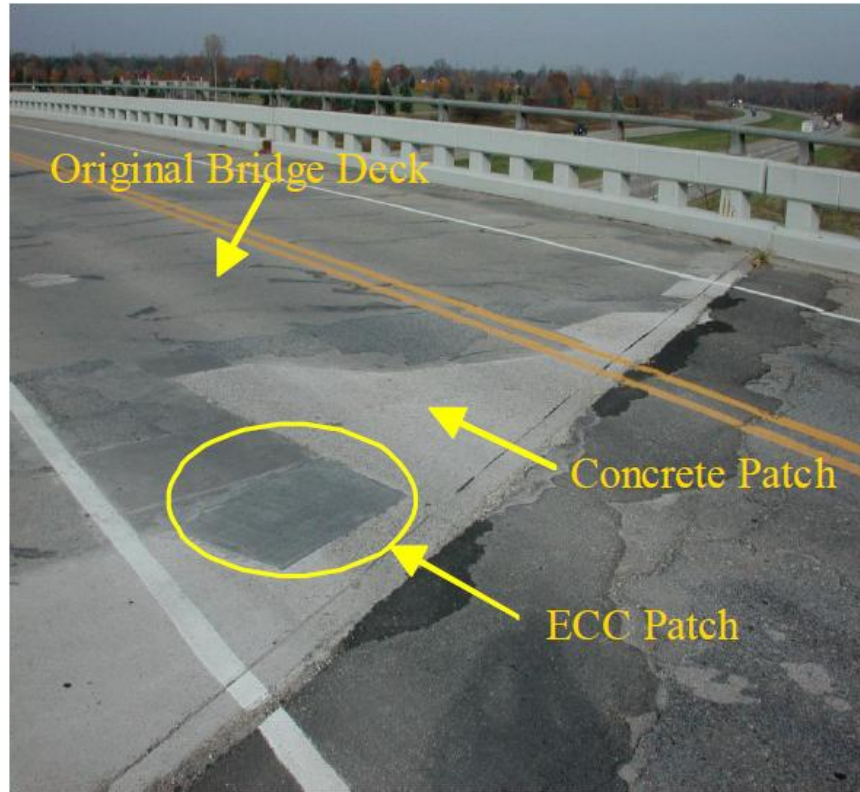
ECC patch repair on Michigan bridge deck (Li et al., 2005)
